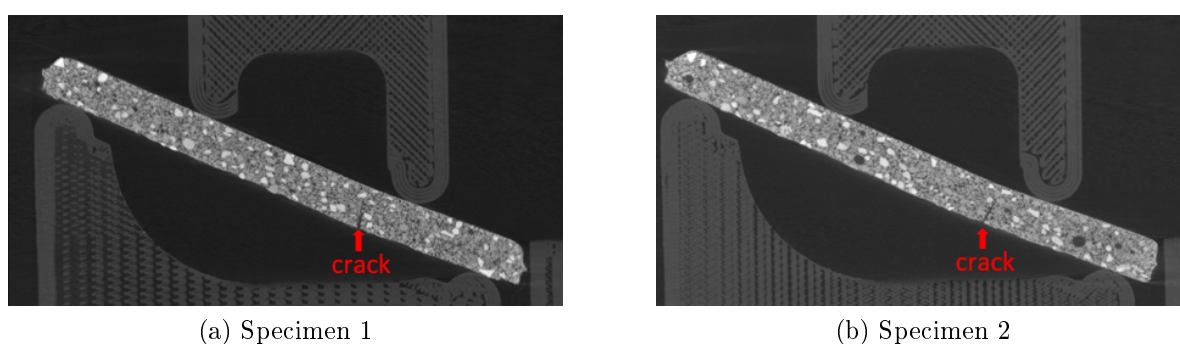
Vertical sections inside the reconstructed volume of the cracked L-2 samples: (a) Specimen 1 and (b) Specimen 2.
